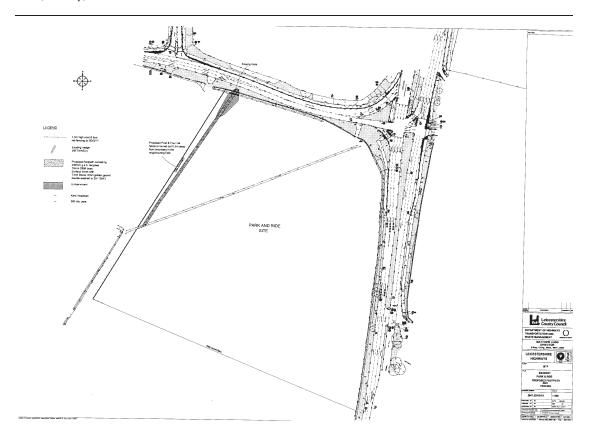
Plan of proposed development. The watching brief will initially cover groundworks for the footpath.
